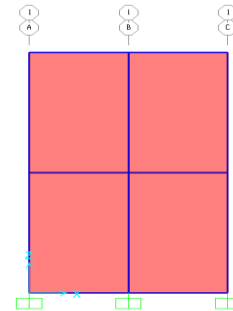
Elevation of cross framed Dhajji-Dewari wall.
